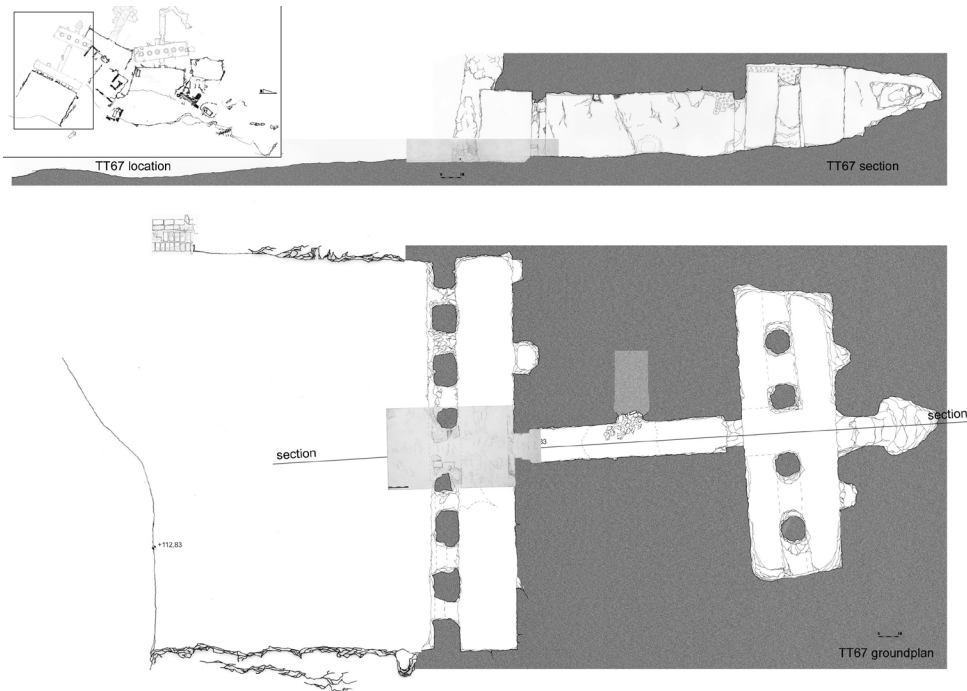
Ground plan and section of TT 67 (Drawing by M. Nagy and F. Pfeffer)
